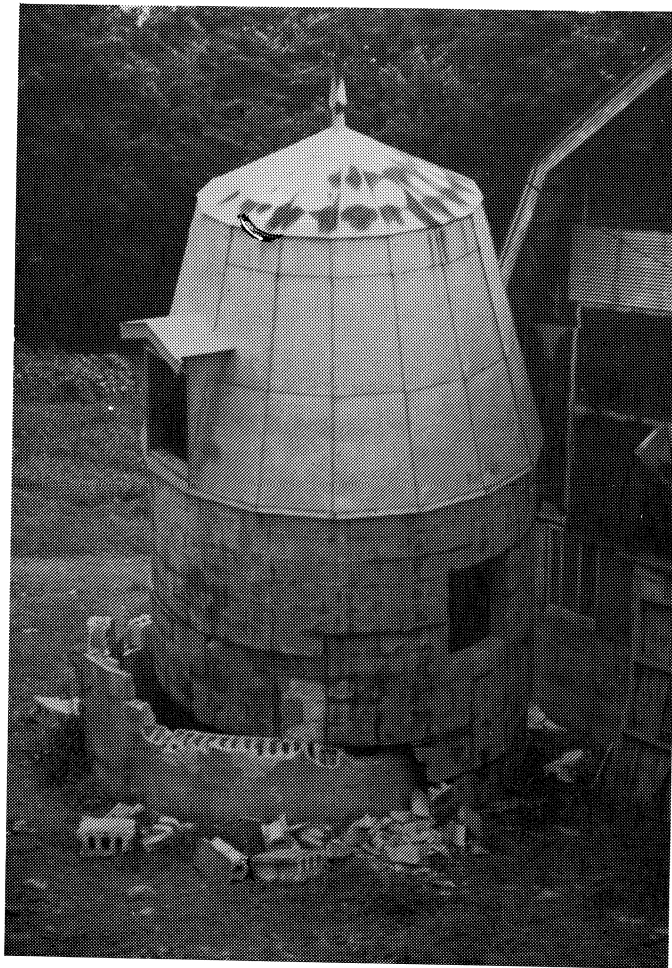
Typical collapsed unreinforced concrete-block silos a few kilometers north of Aonae.
